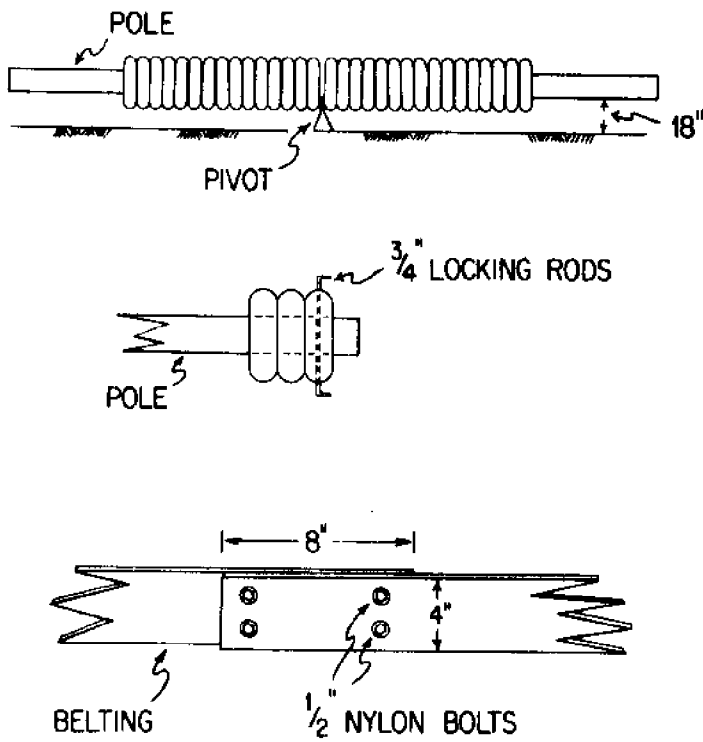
Construction Details Showing Belt Connection, Locking Rods and Pole Pivot
